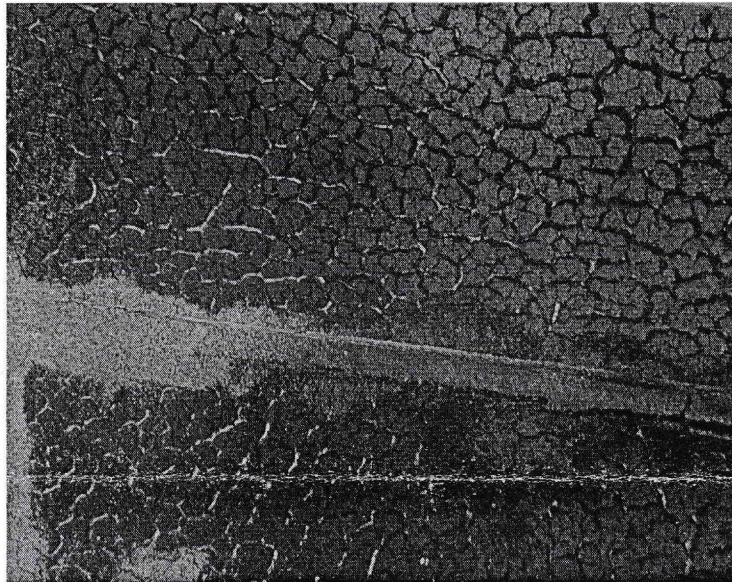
Section of the block wall showing cracks in the concrete blocks.
